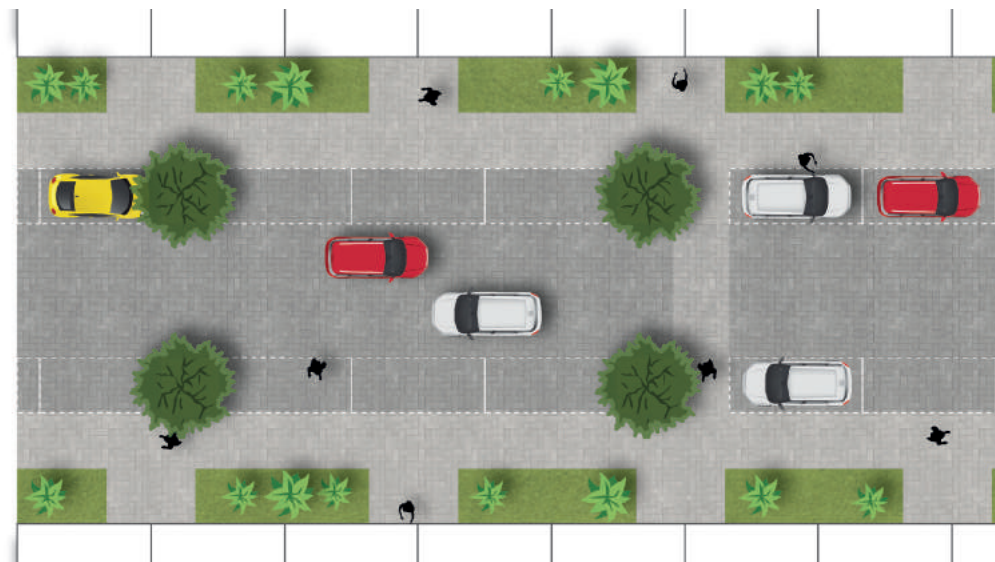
R: A good formal arrangement for a primary street that incorporates parallel parking with regular tree planting within kerb build outs reducing its impact on the street space (Plan)
